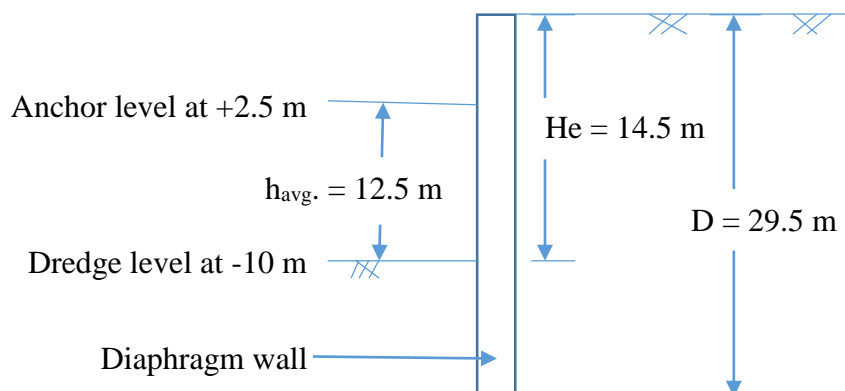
Diaphragm wall with anchor at +2.5 m
